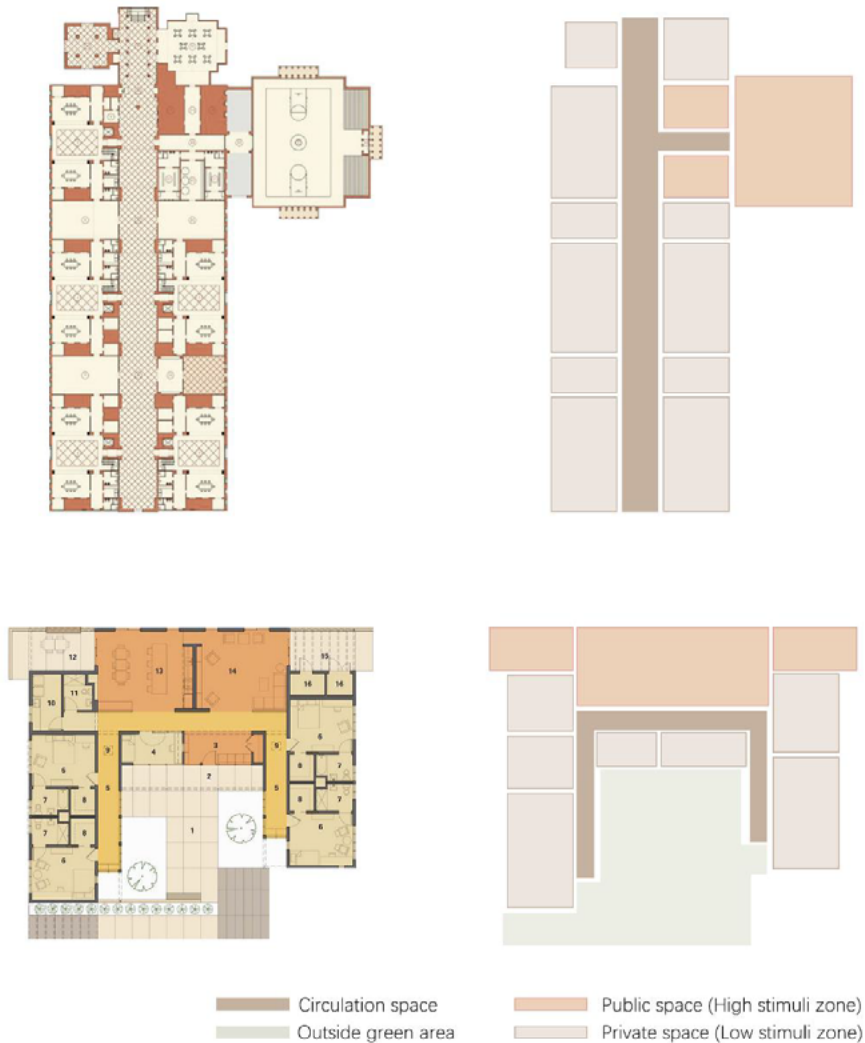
Plan layout of Advance St. Coletta School (up)
